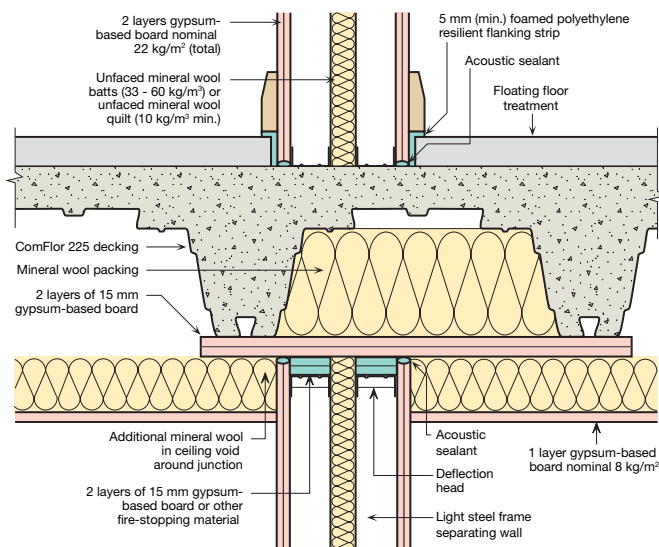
Acoustic detailing at junction between floor and separating wall without ASB
